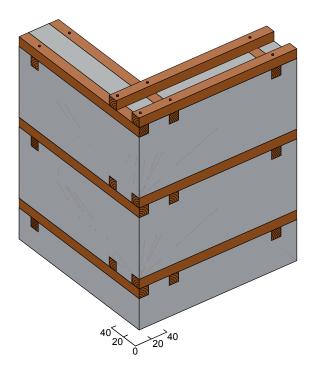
System of a *bhatar* construction. CAD: Martin Pospichal. Details provided by the author.
